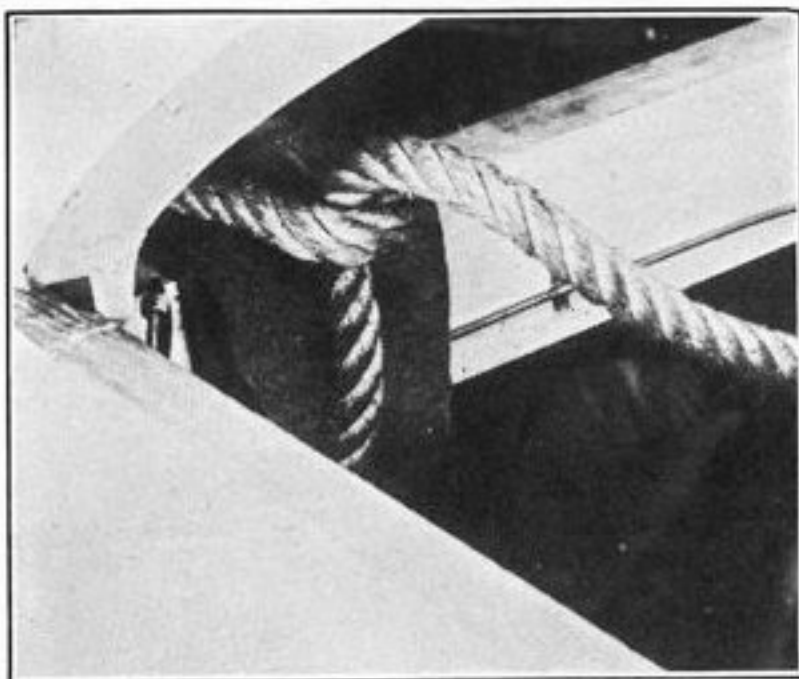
TYPE OF SLIPKNOT USED TO SECURE LIFTING ROPES TO SIDEWALK BEAMS. NOTE PADDING UNDER ROPE TO PROTECT BEAM FROM CUTTING.
